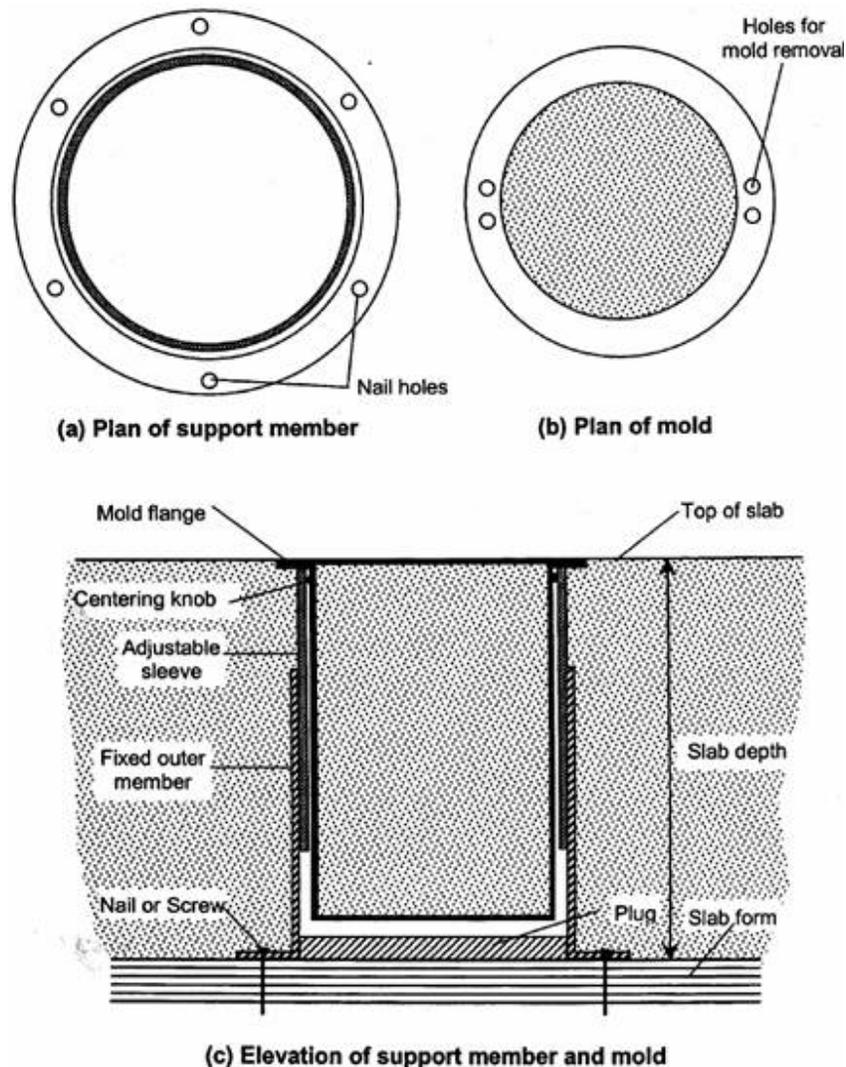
ASTM recommendation for the cast-in-place concrete cylinders molds (ASTM C 873 2003)
